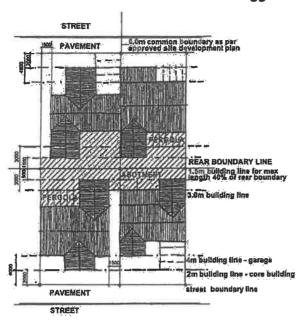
Illustration of stepped building line along rear boundary that encourages a varied building footprint
